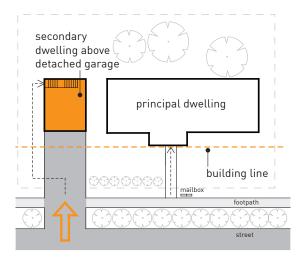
F.2-2: Detached secondary dwelling above a detached garage.
